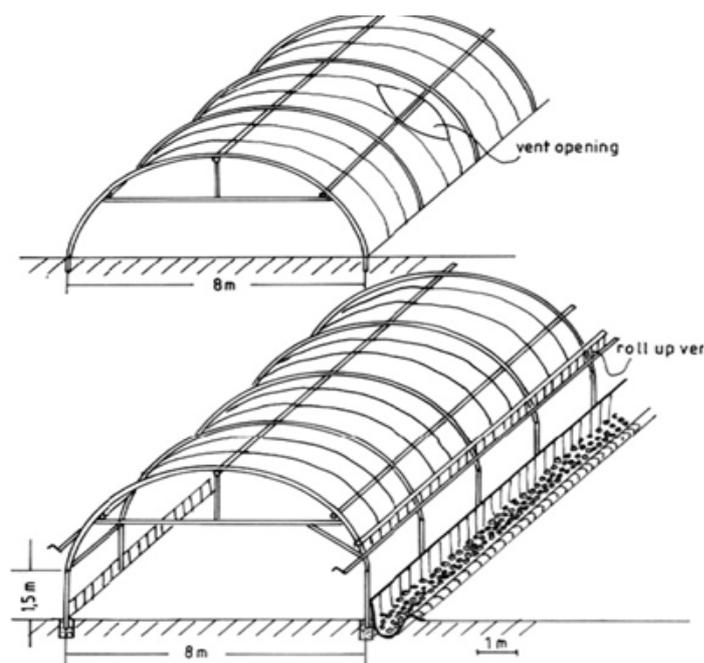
Improvement of existing round-arched greenhouses by installing vertical sidewalls
